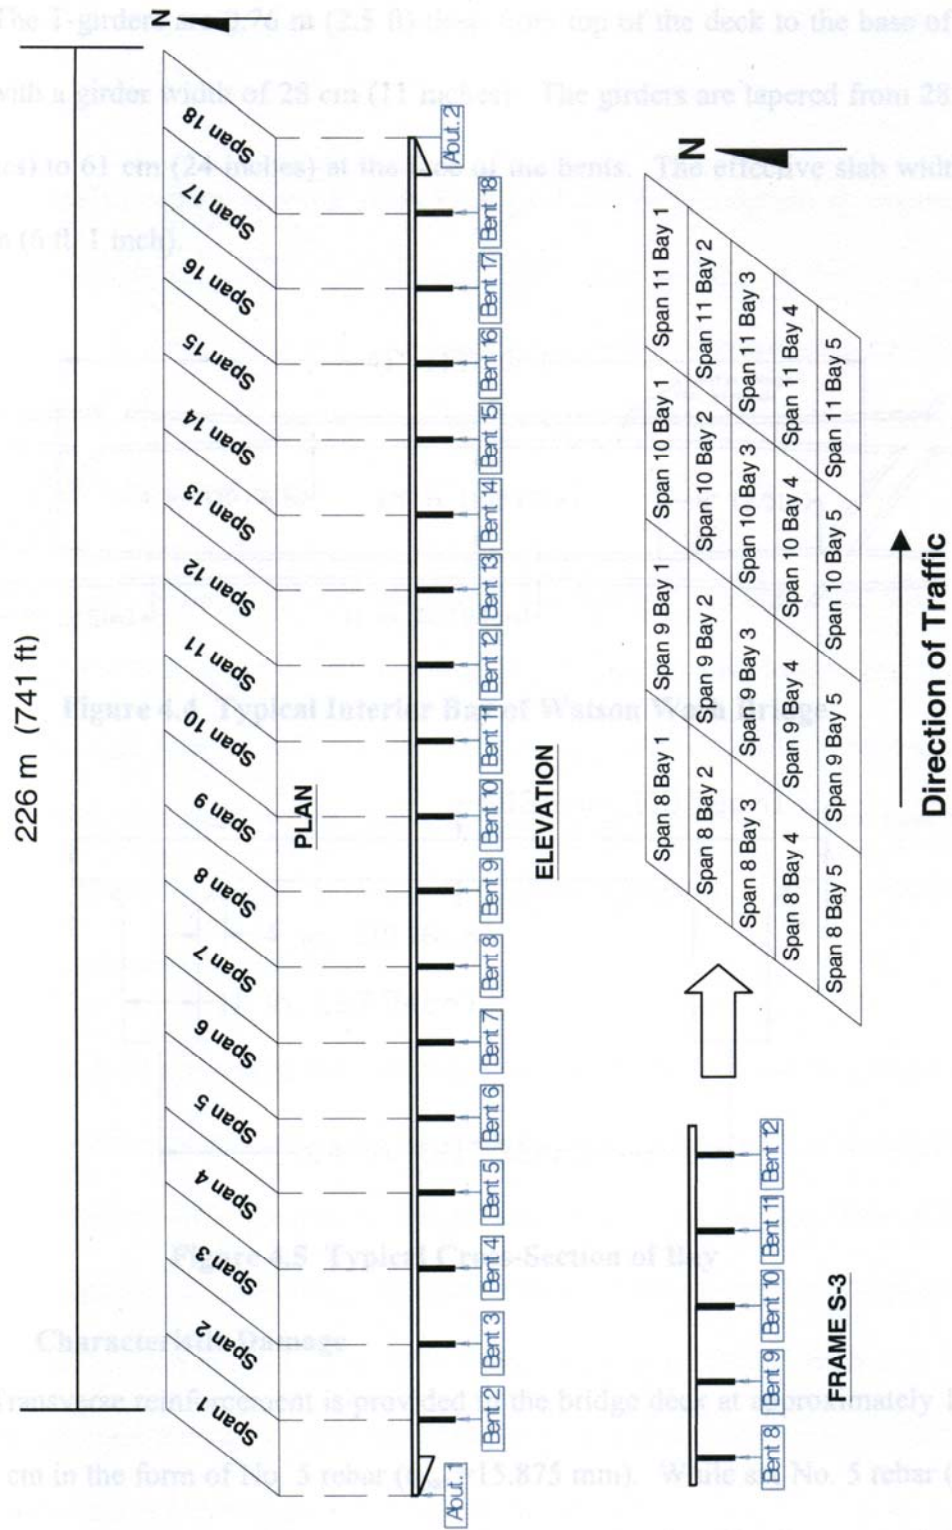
Overview of Watson Wash Bridge and Numbering of Spans
